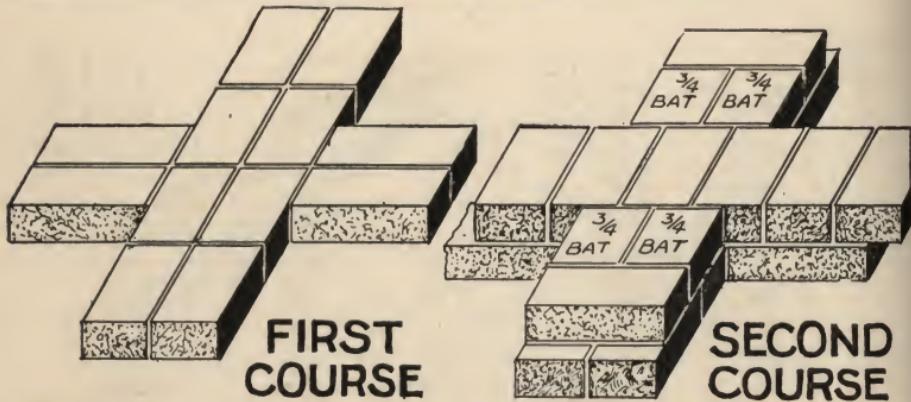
,260 to 4,263.—Stopped intersection; 12 in. wall in common or American bond.
